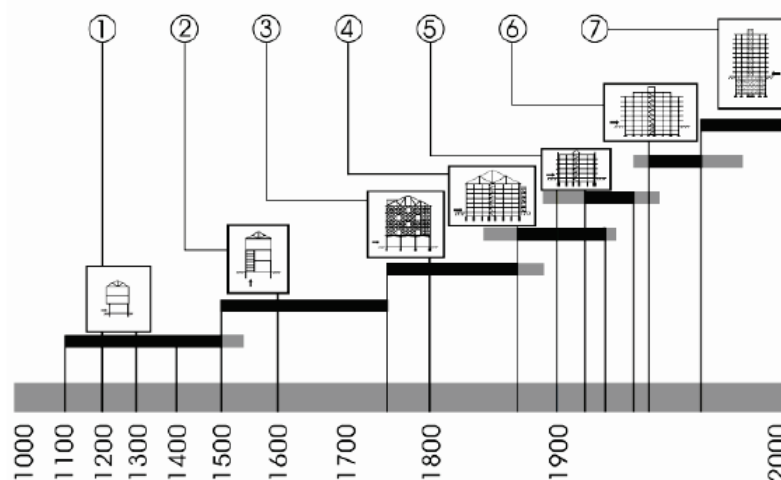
Evolution of the building typologies in Portugal: 1,2 – before 1755; 3 – Pombalino; 4 – “Gaioleiro”; 5 – Mixed masonry and concrete; 6,7 – reinforced concrete
